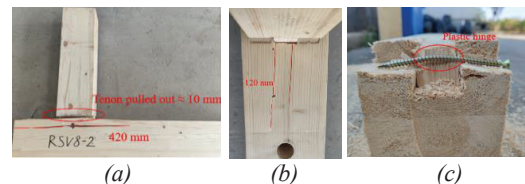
Failure modes of RSV8 group: (a) pull-out of tenon and splitting on the side of column; (b) crack on the lower end of mortise of column and crush of wood and (c) STS yielding.
